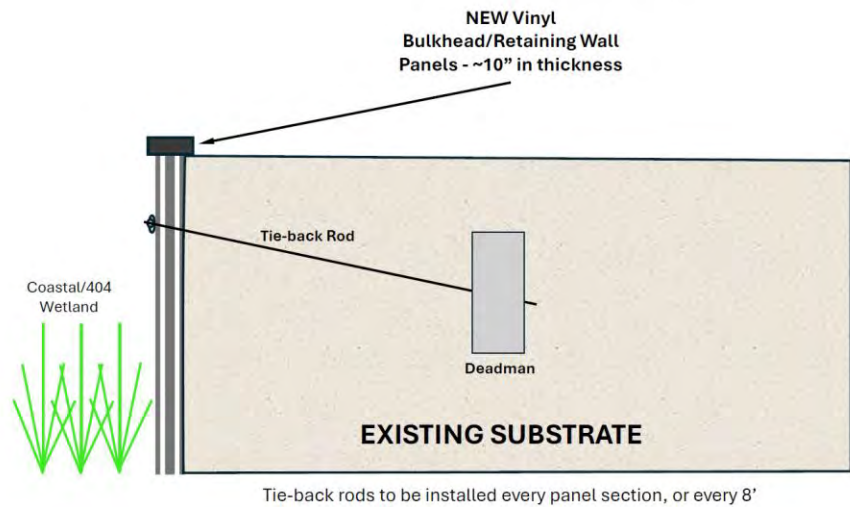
Bulkhead Cross Section Detail (provided by the applicant)
